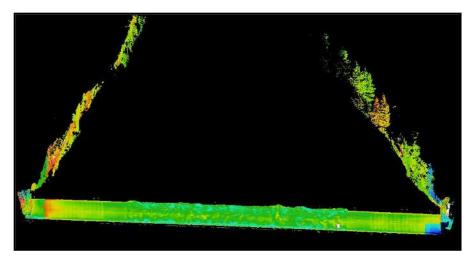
Clear Creek Tunnel 5 LIDAR Cross Section with Overburden
